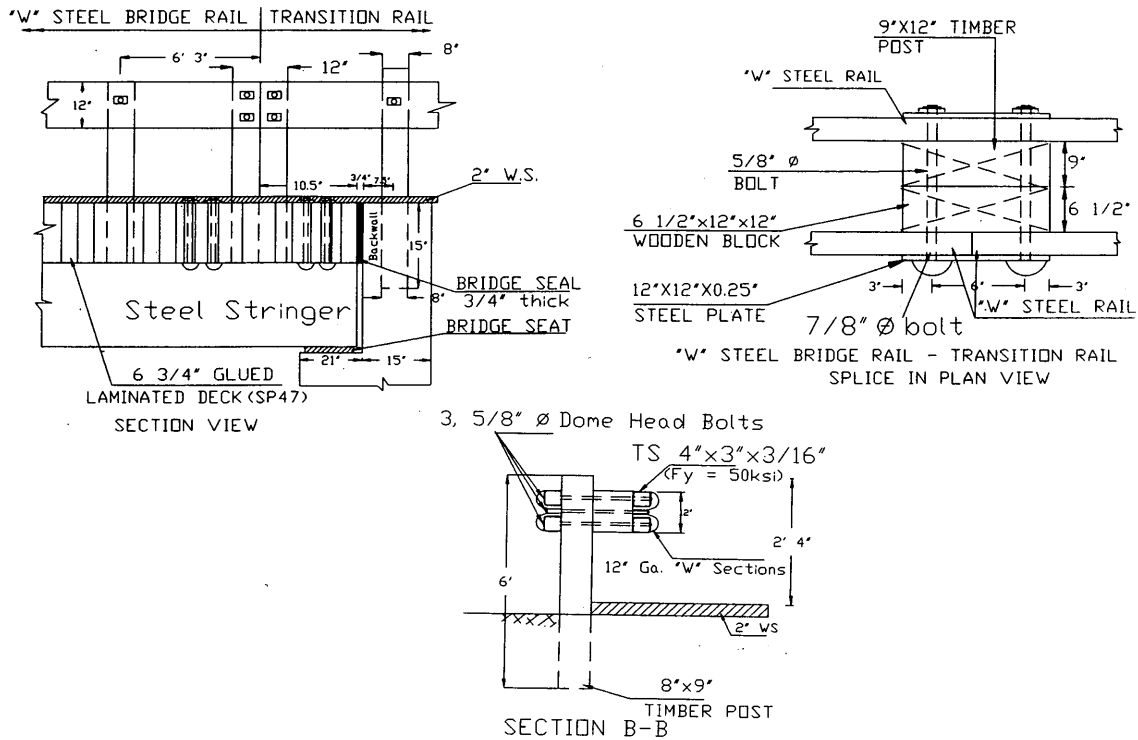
Timber Bridge Rail System 3 for PL-1: cross-sectional details of transition rail.
